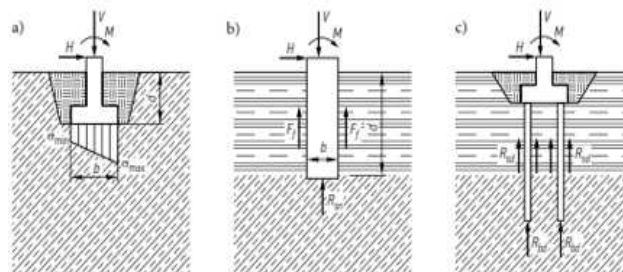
Foundation types: a) shallow belt foundation b) deep foundation c) pile foundation (Ramoškevičiūtė 2013).
